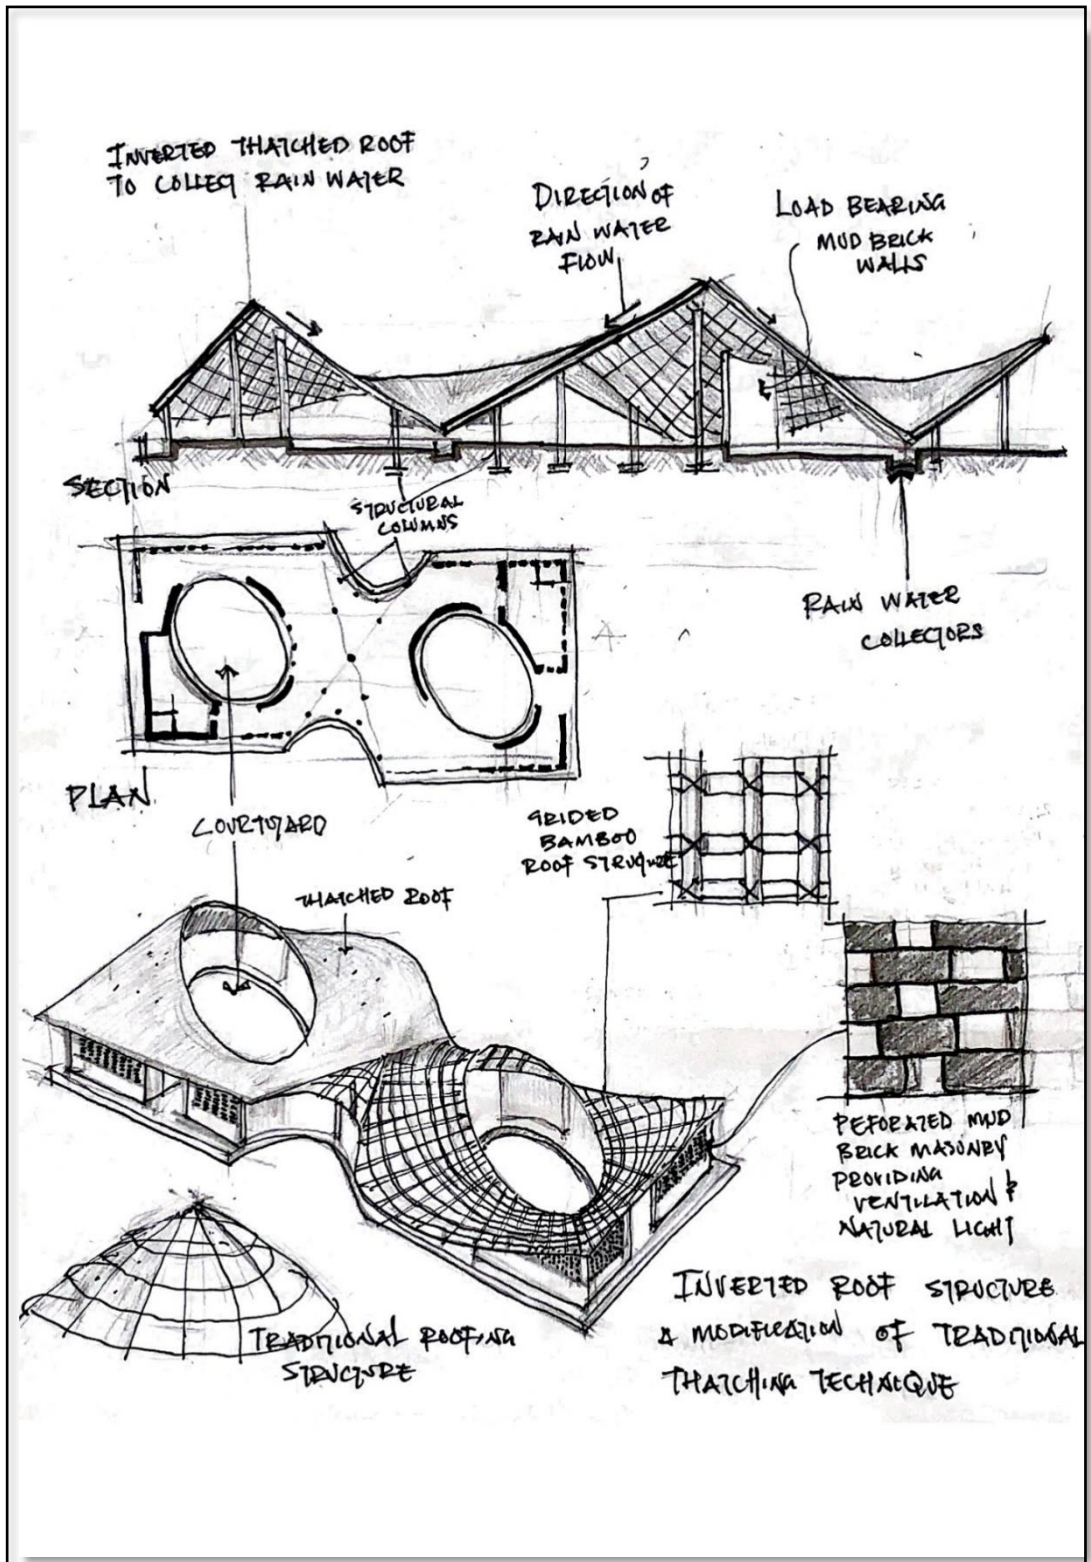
Sketches of the Structure Plan and Section Showing Roof Structure
